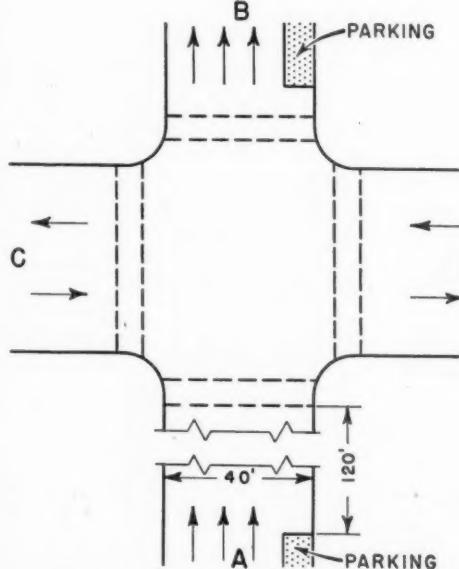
Illustrative example 10: information as in figure 33, except for parking on right side only with 120-foot restriction.
